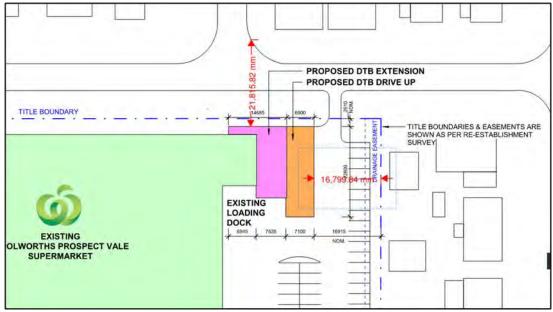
Excerpt of site plan and separation of buildings from neighbouring properties.
